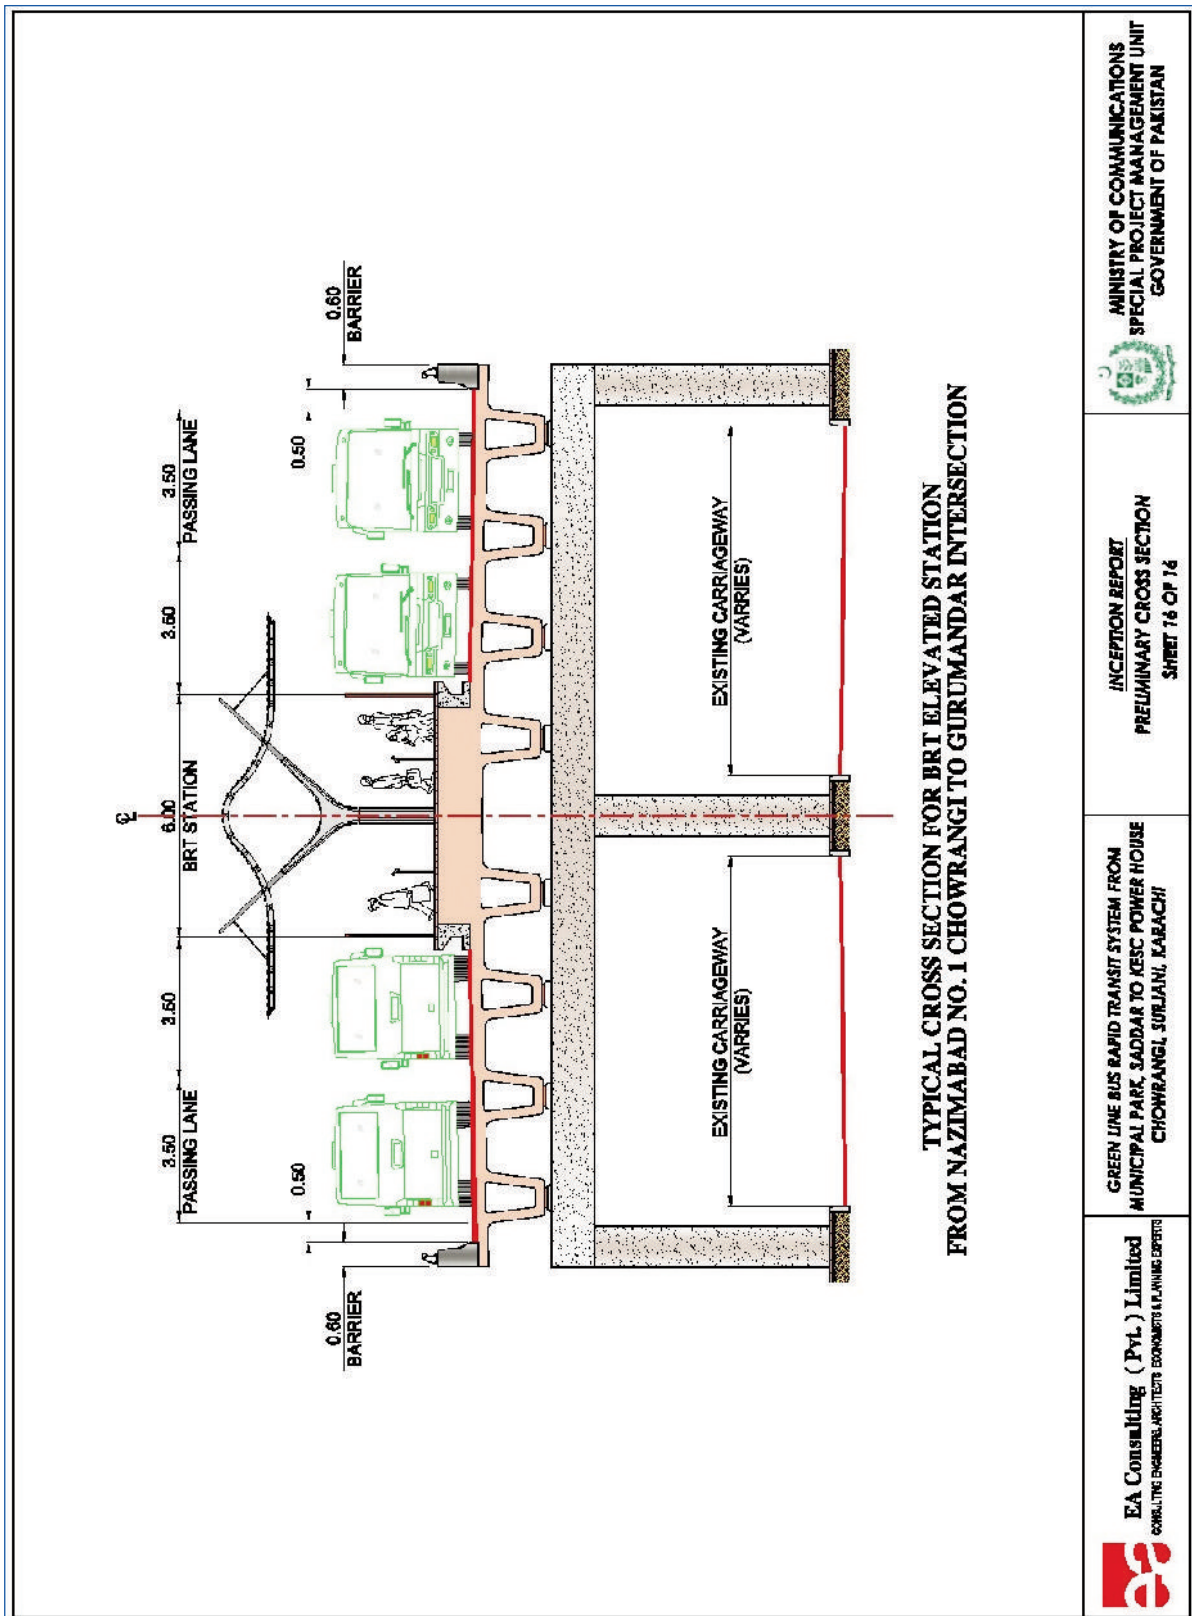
Segment 4: X-section of BRT Elevated Station
